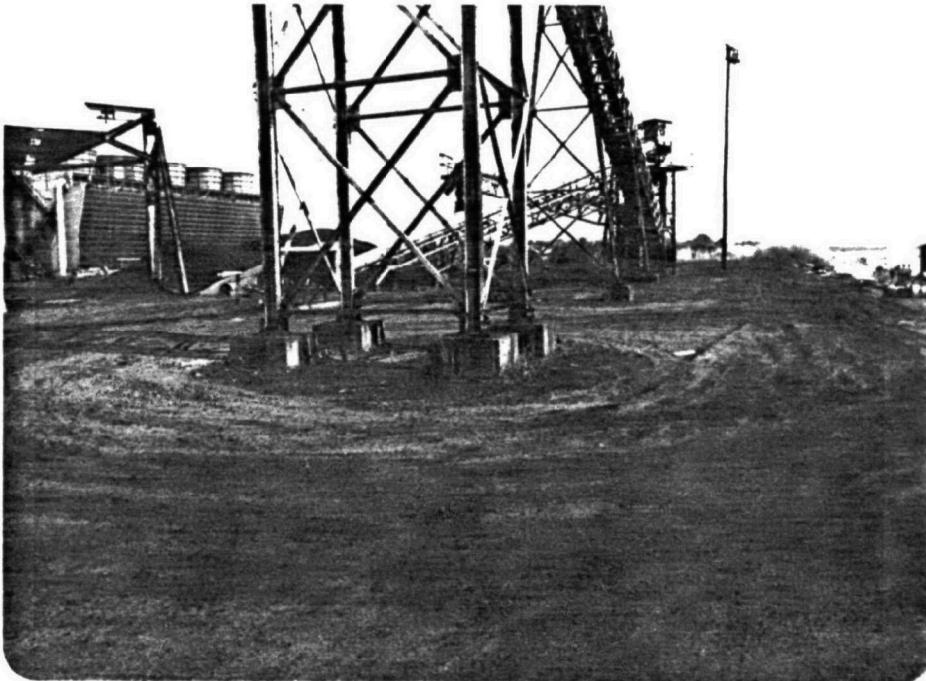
View from ground level facing north showing coal storage area, handling facilities, and the cooling tower serving Boiler 8.
